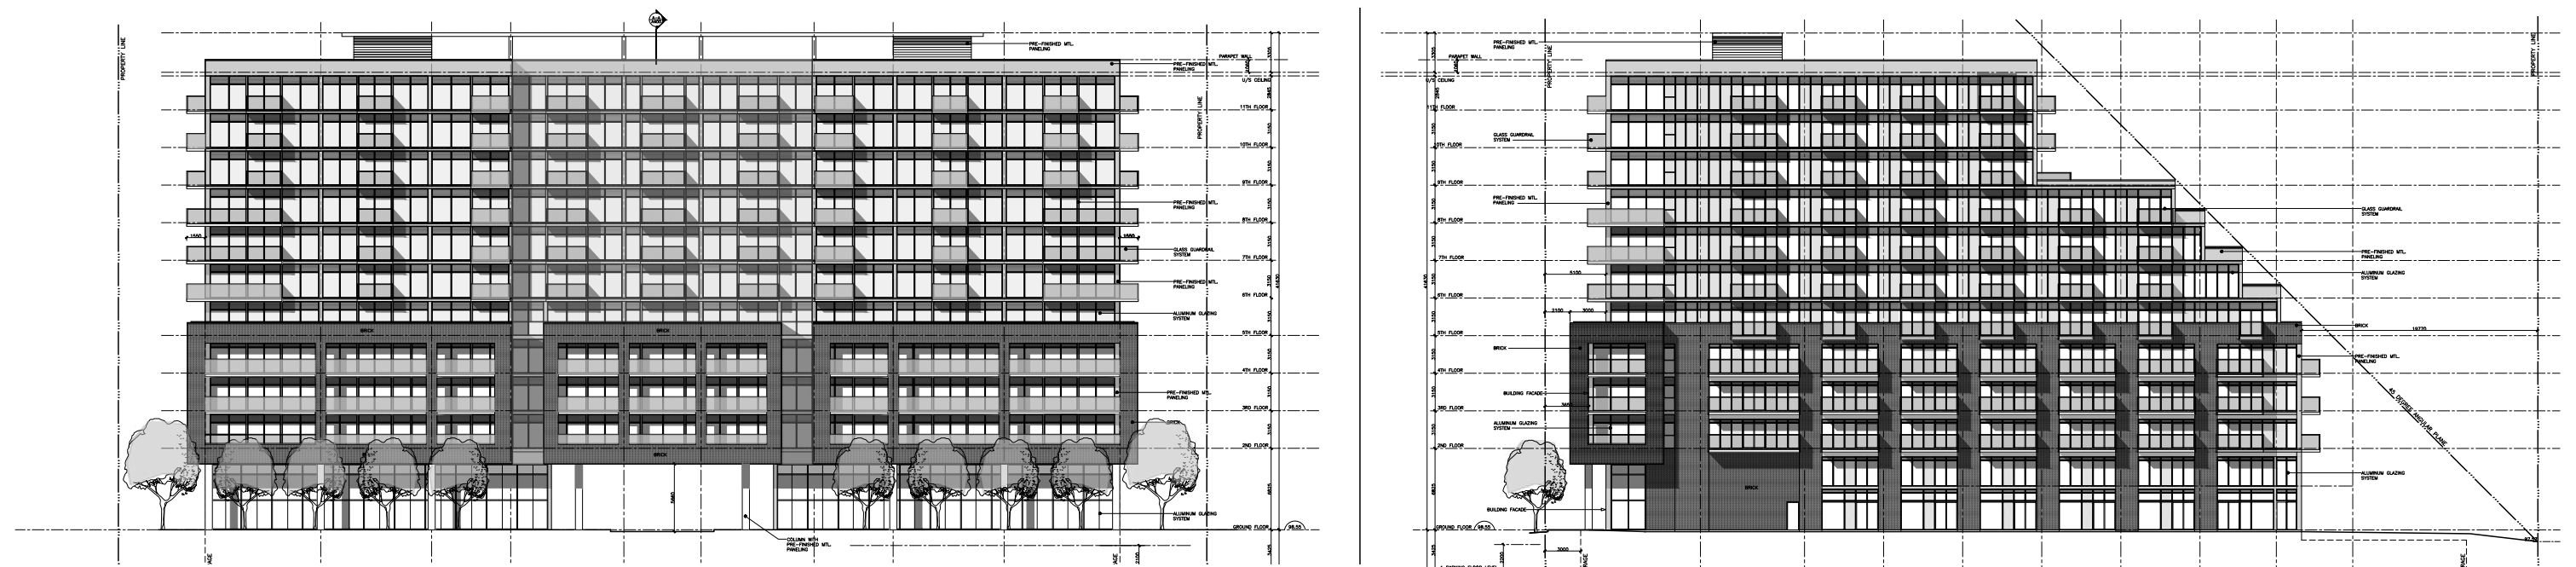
North Elevation (Left) and West Elevation (Right) - Prepared by Terry Martino Architects
